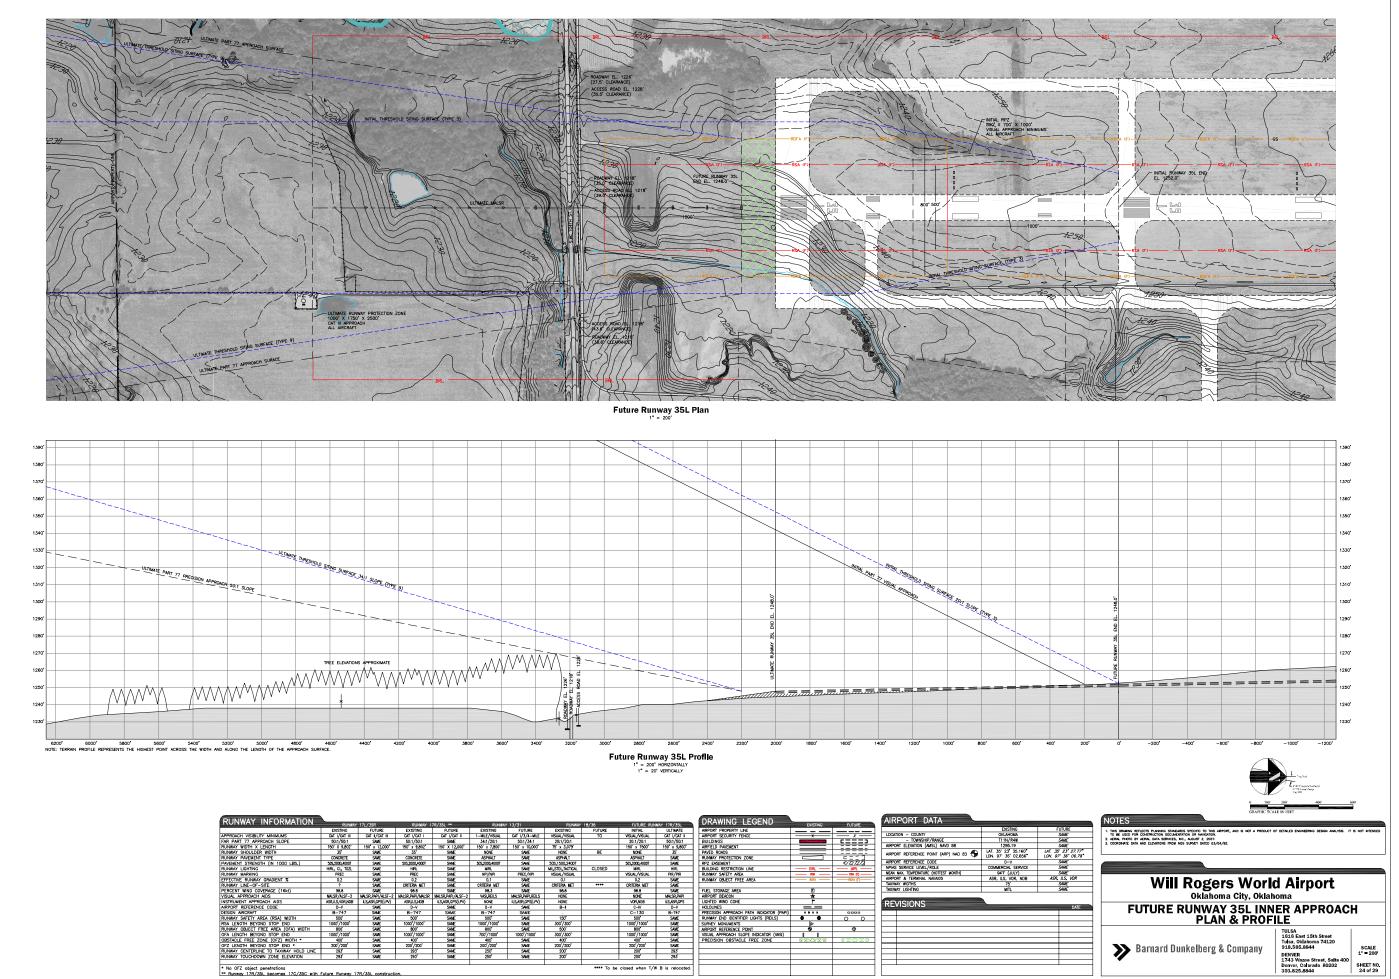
Inner Portion of the Approach Surface - Future Runway 35L Plan & Profile G.35
